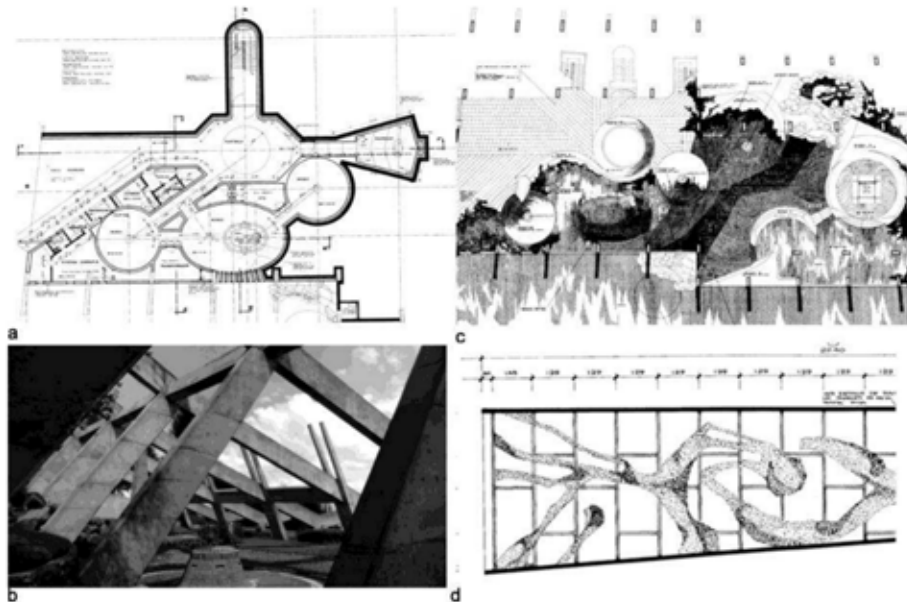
Templo de la Patria a) First level plan b) Second level plan c) Garden photograph d) Mural access detail⁷
